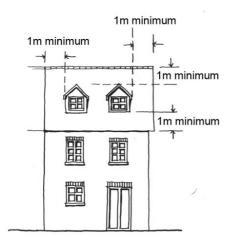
Dormers should be set below the ridges, set above the eaves and set in from the boundary and the edge of the roof.
